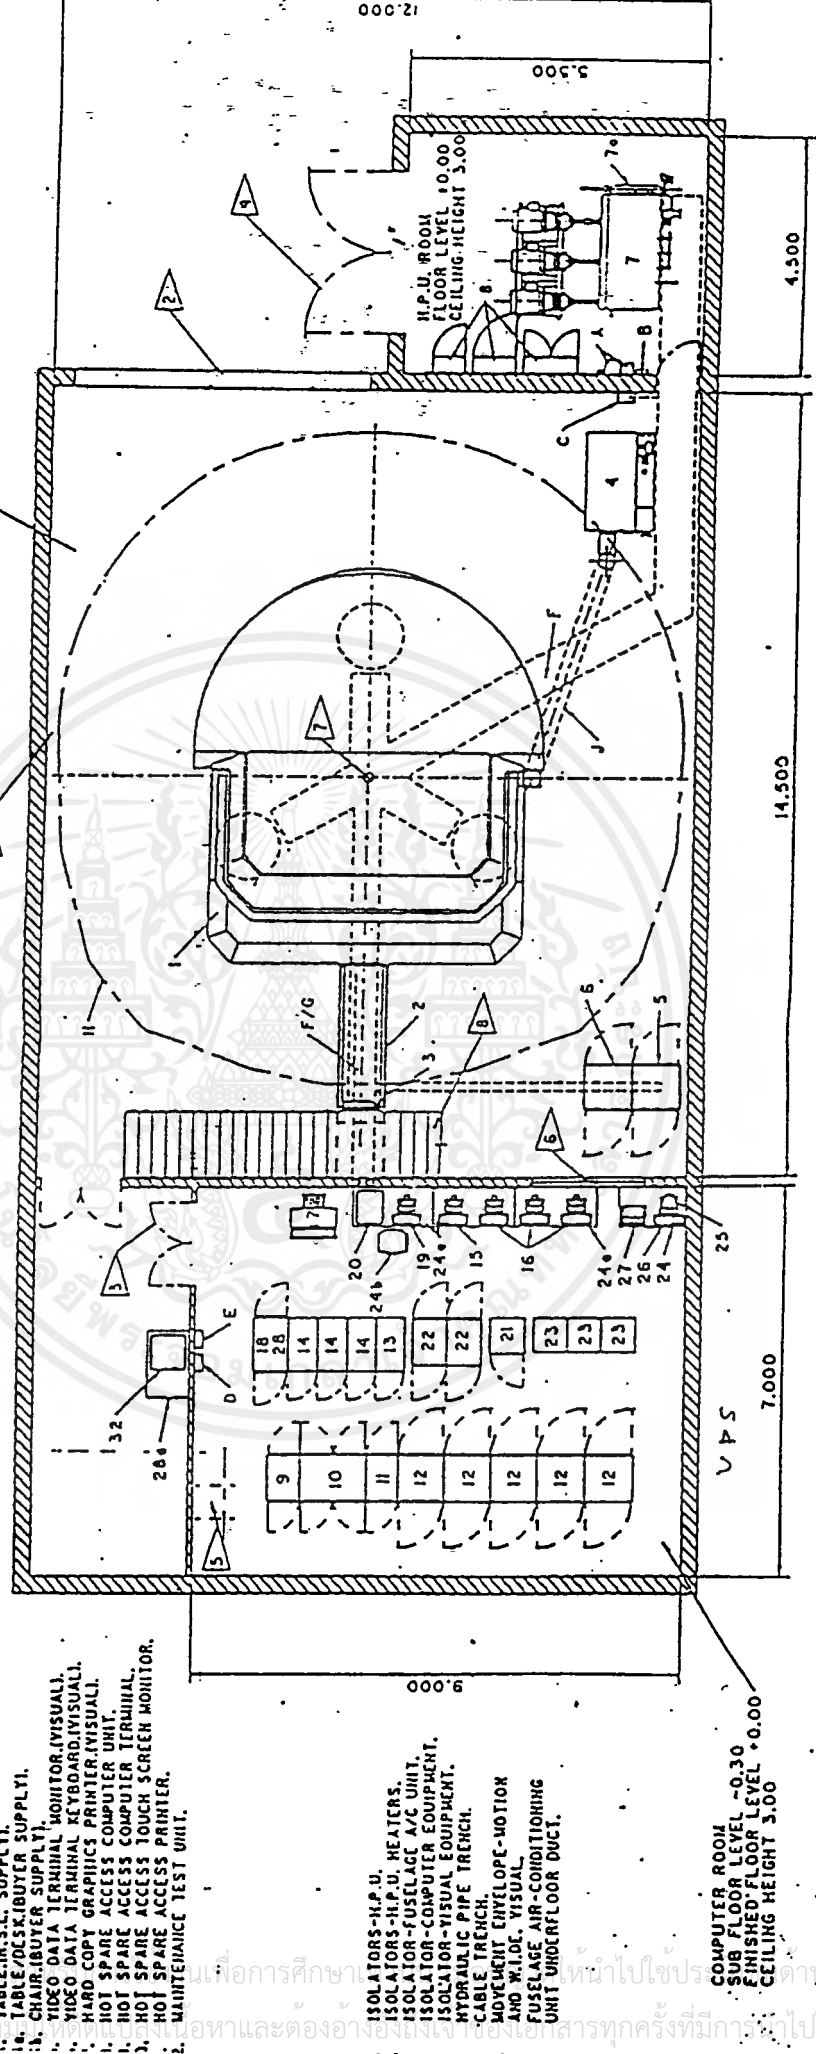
FLIGHT SIMULATOR COMPLEX - FLOOR PLAN LAYOUT
